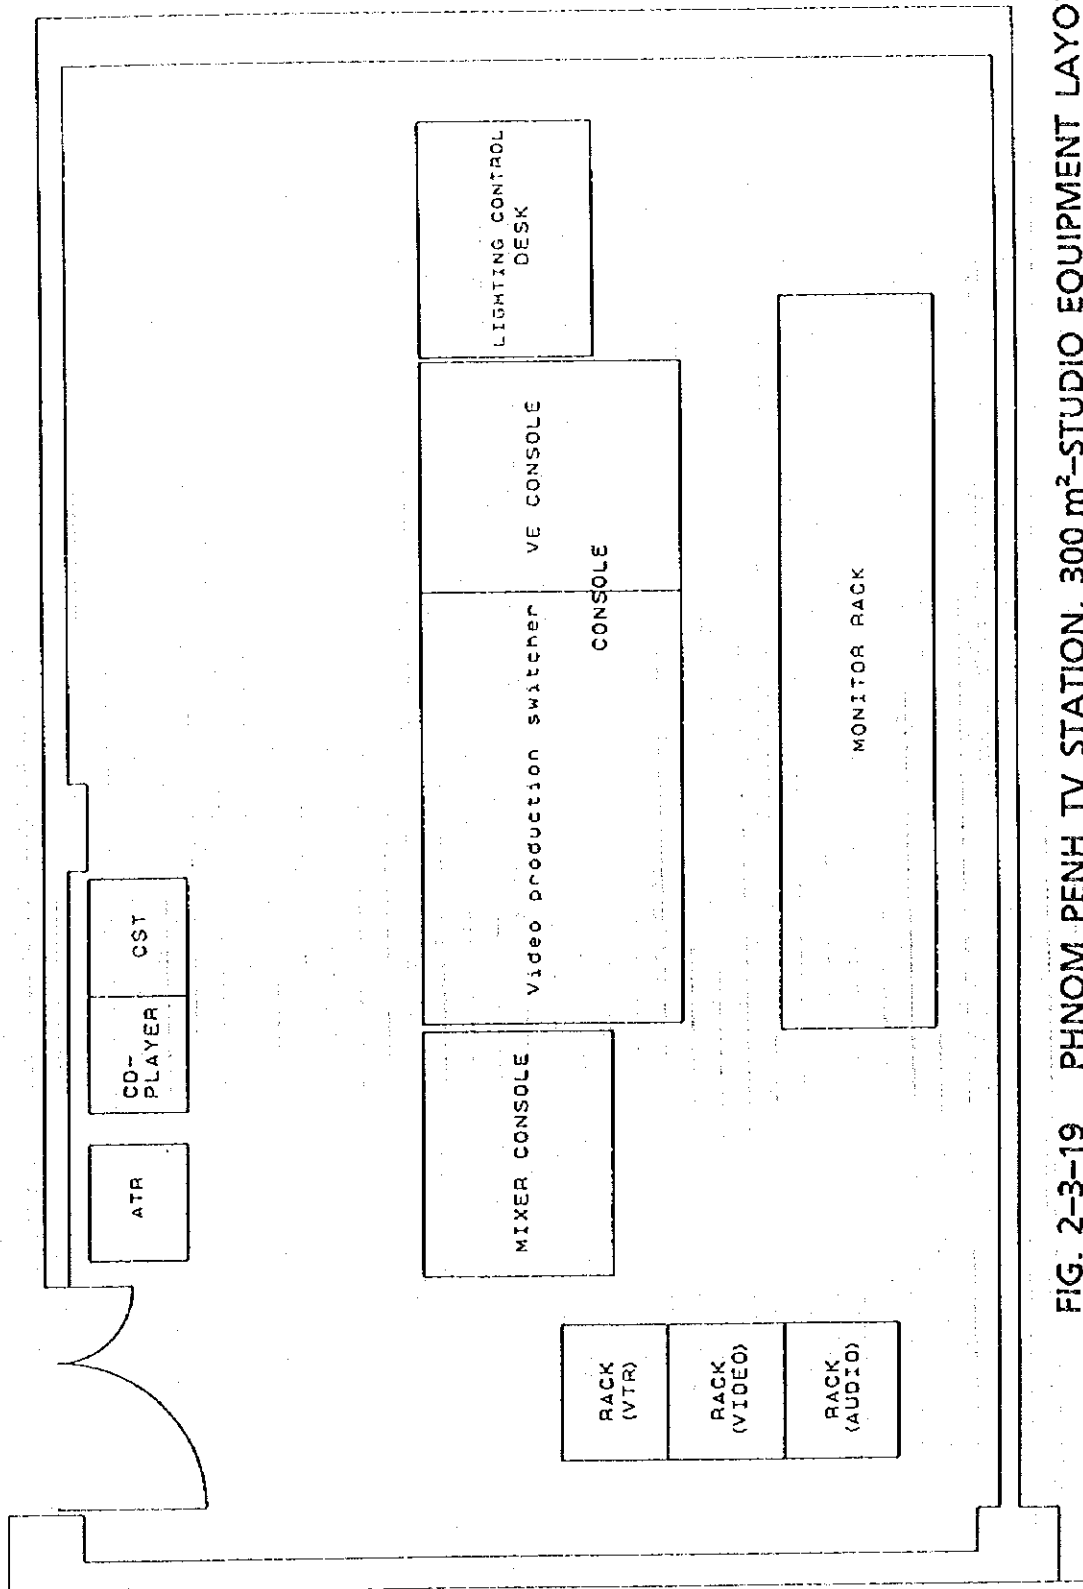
PHNOM PENH TV STATION, 300 m²-STUDIO EQUIPMENT LAYOUT
